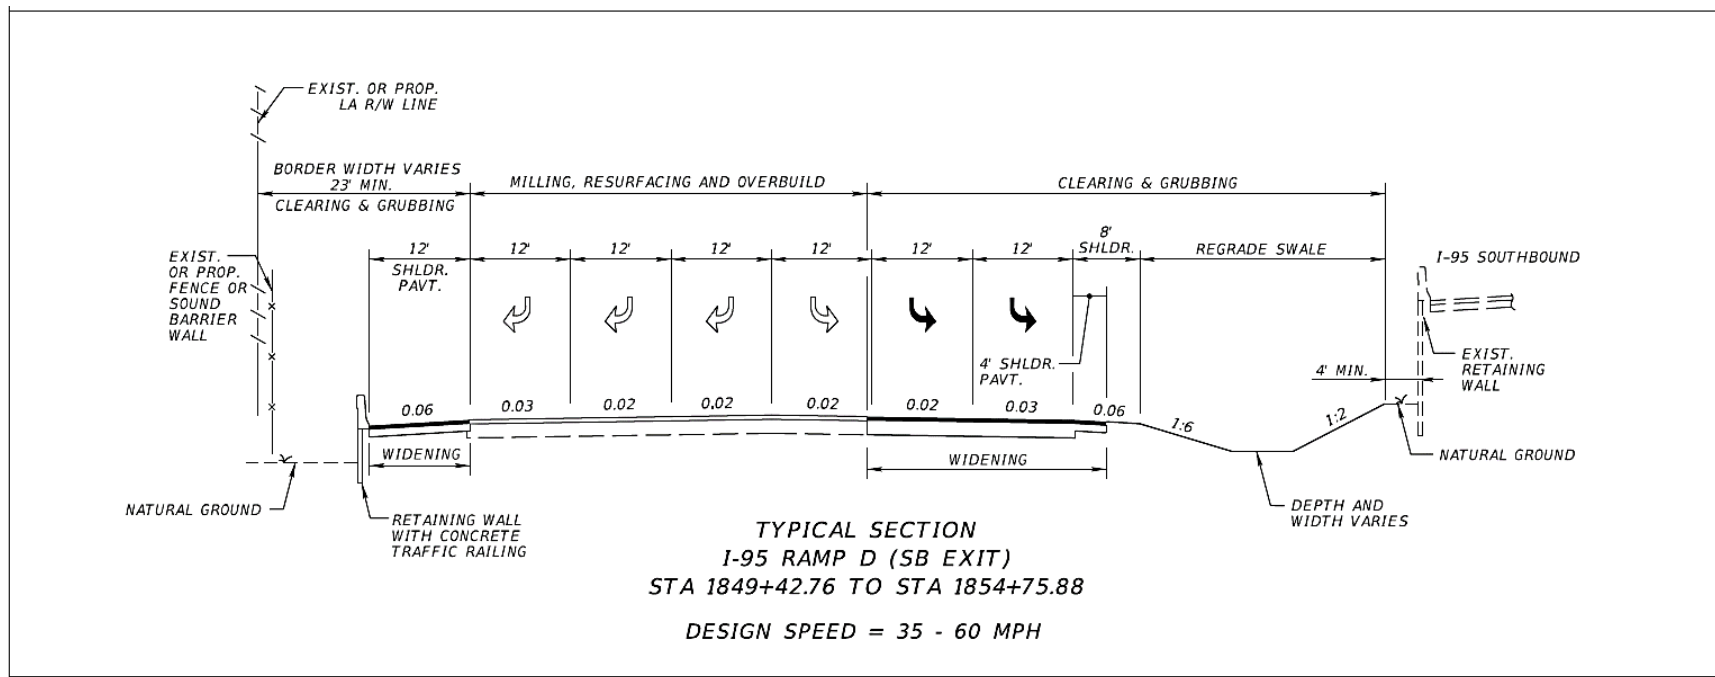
Alternative 1: Modified Concept I-95 Ramp Auxiliary Lane Typical Section
